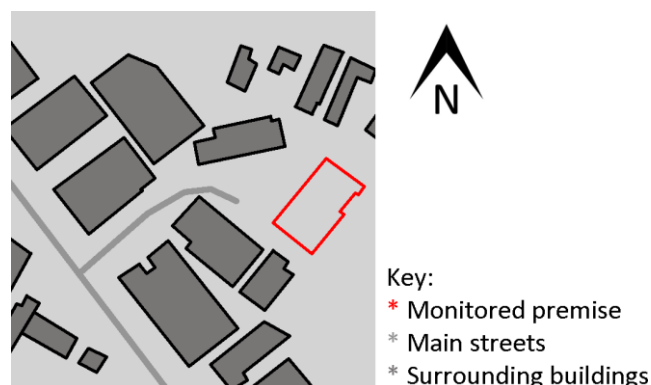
Site plan of Building 1 (Not to scale) (image adapted from (Google 2012))
